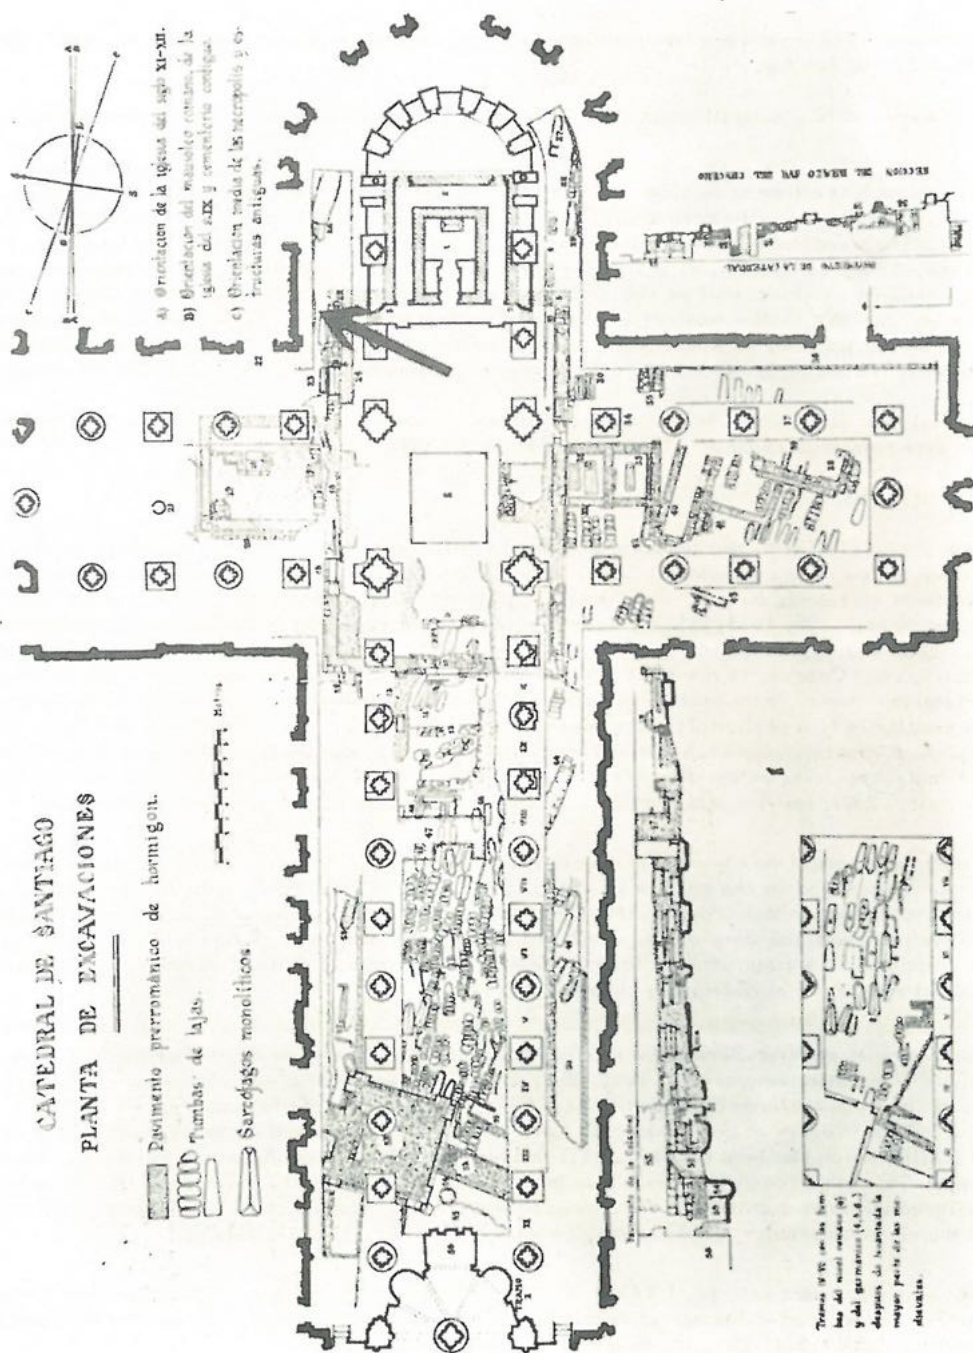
Plan of Excavations at Santiago (J. Guerra, 'Ciencia tomista', 1960).
